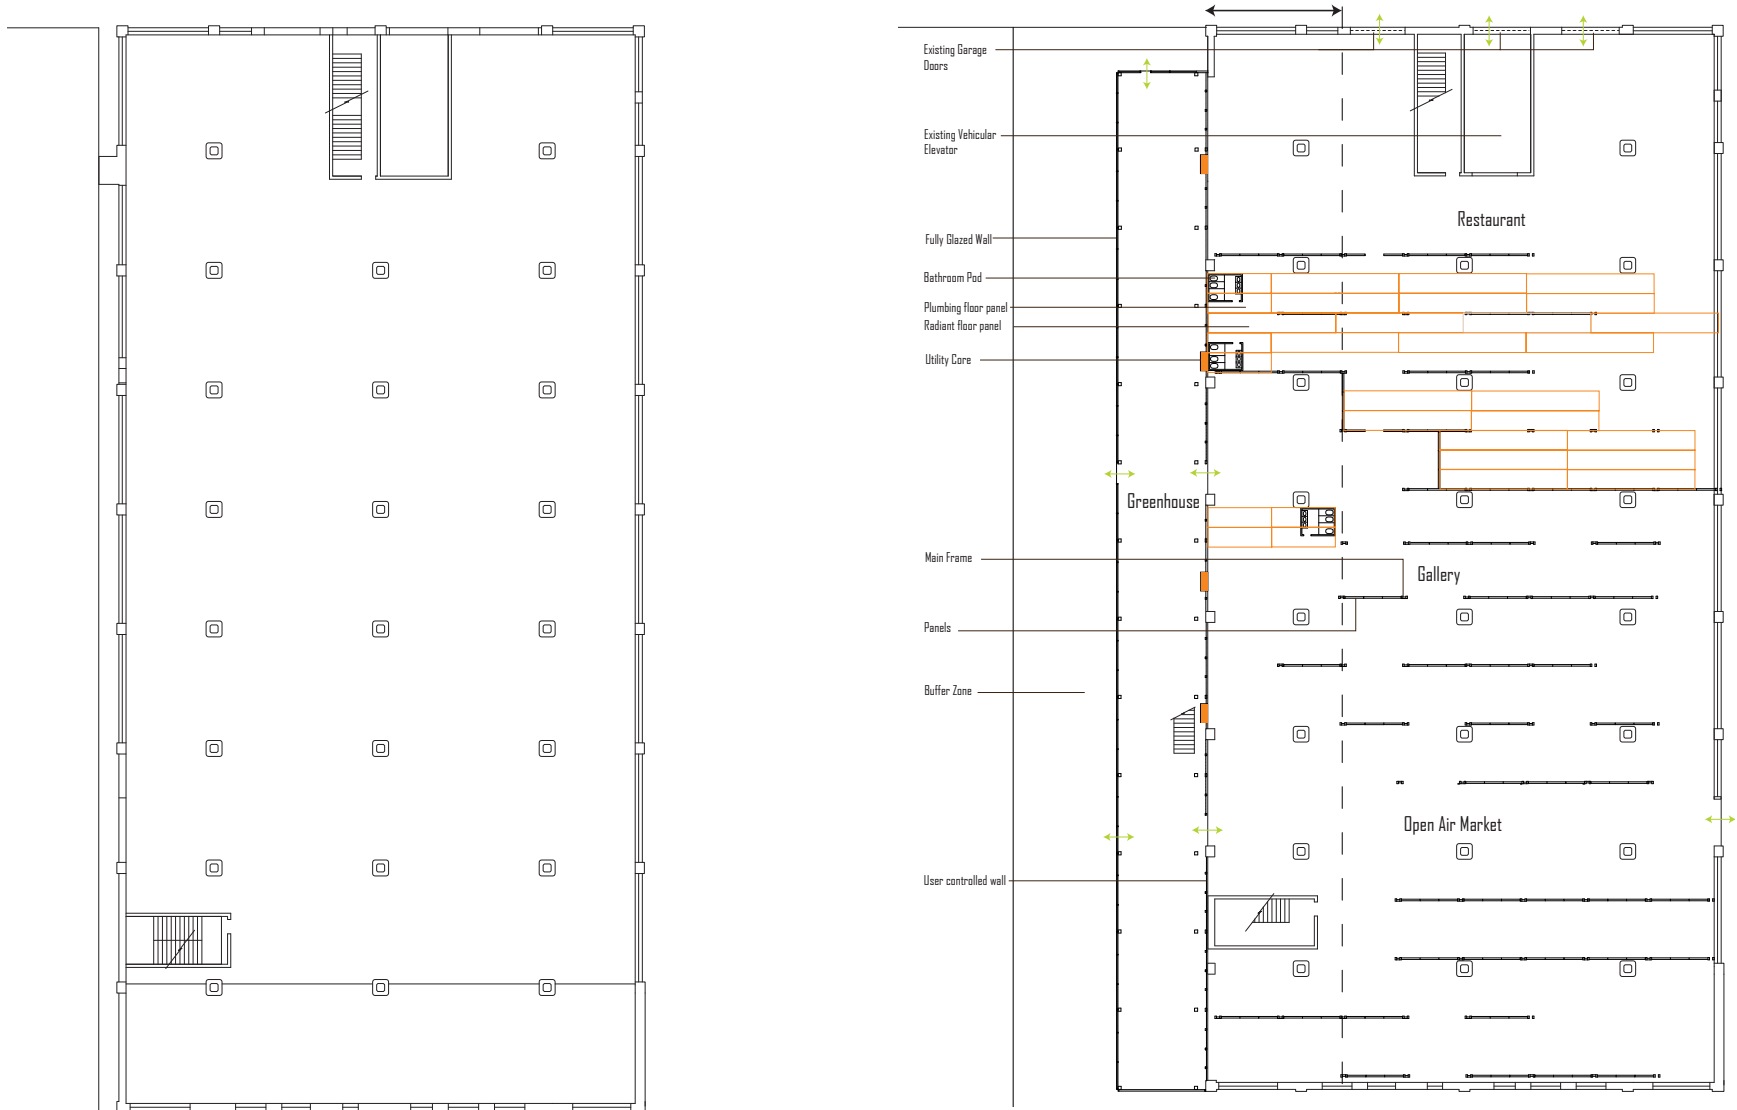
Existing building ground floor plan (left), proposed ground floor plan (right)
